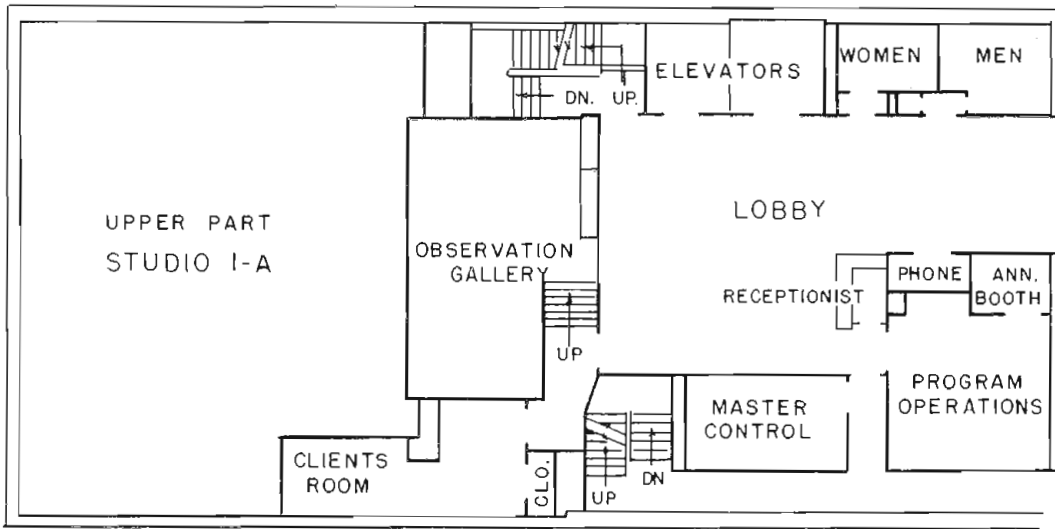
First floor plan of American Broadcasting Co. building in New York City
